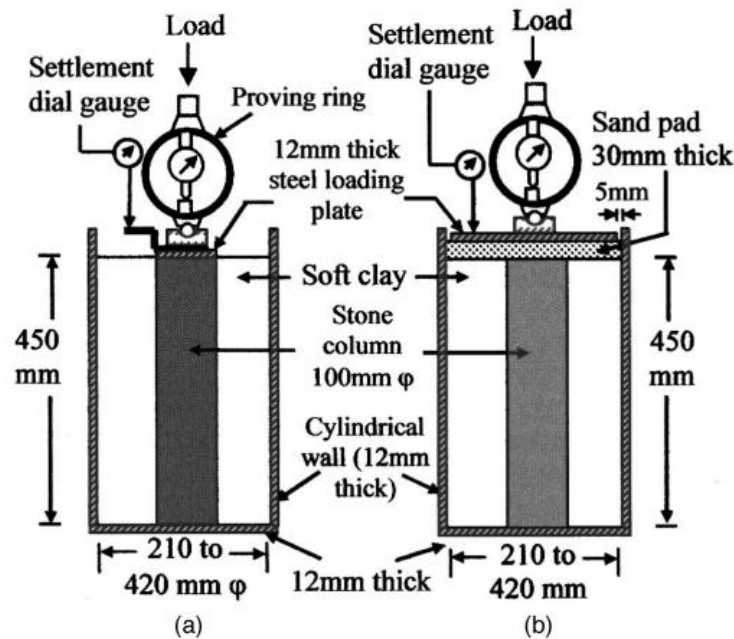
Single column test arrangement: a. column area loading; b. entire area loading (Ambily & Gandhi, 2007b).
